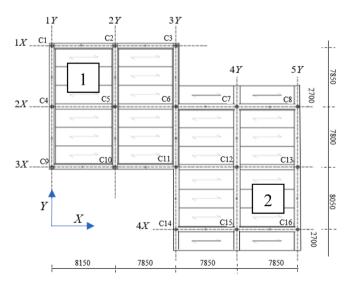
Structural plan of the case study building (dimensions in millimeters).
